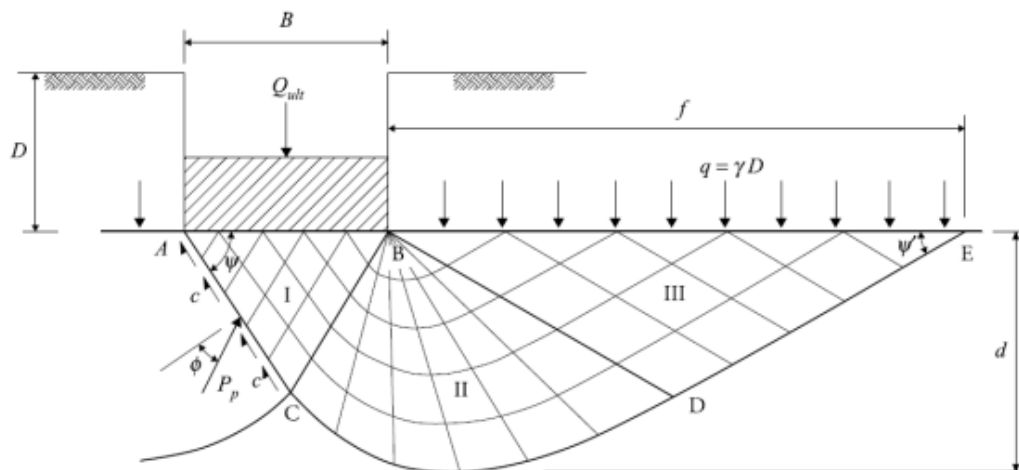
Failure mechanism of a shallow foundation (Matos Fernandes, 2011)
